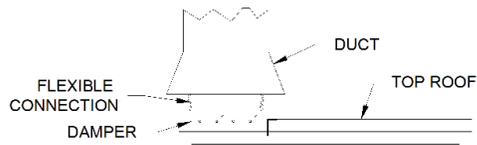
Side view of Return duct to be large enough to cover exposed area
